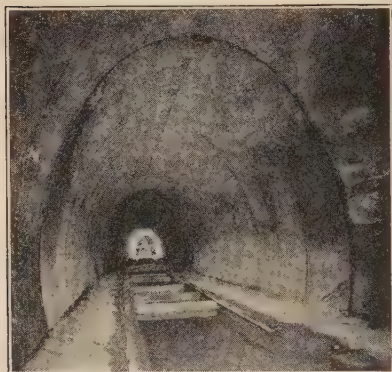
CONDUIT OF THE NEW YORK CITY WATER SUPPLY SYSTEM.
